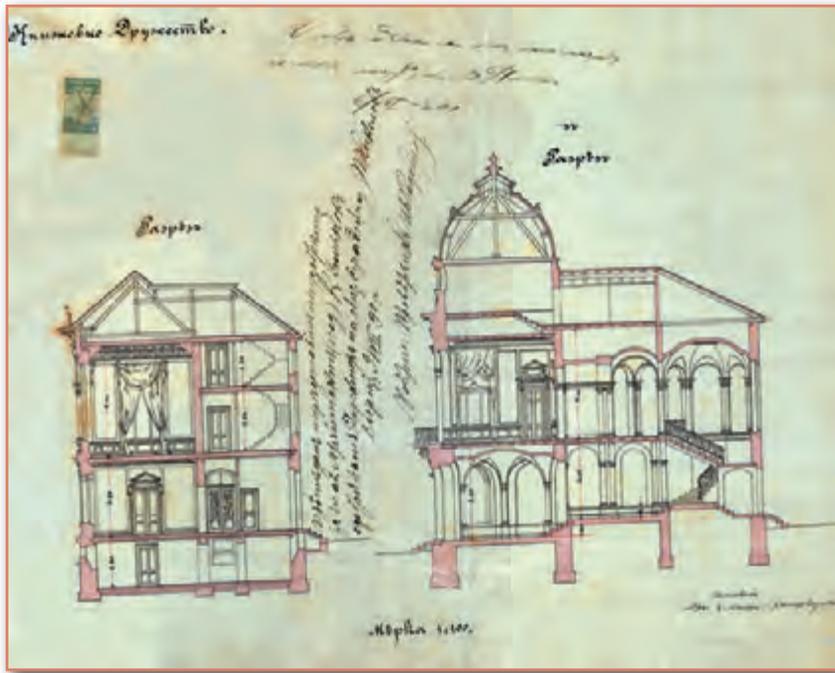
Cross sections of the plans by Heinrich Jacob Meyer and Theodor Hünerwadel (Archive SM-DAUP)
